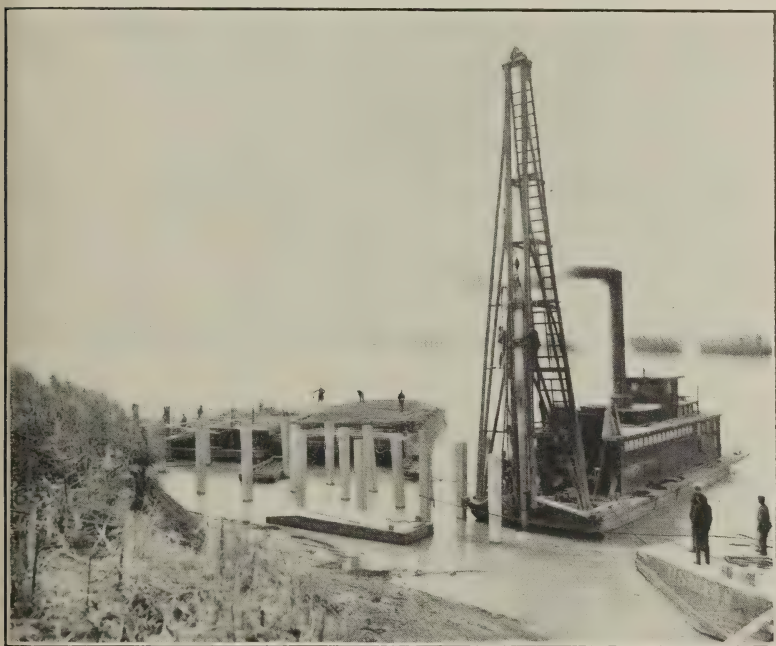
Driving concrete piles at Elwood Bend, Mo.
